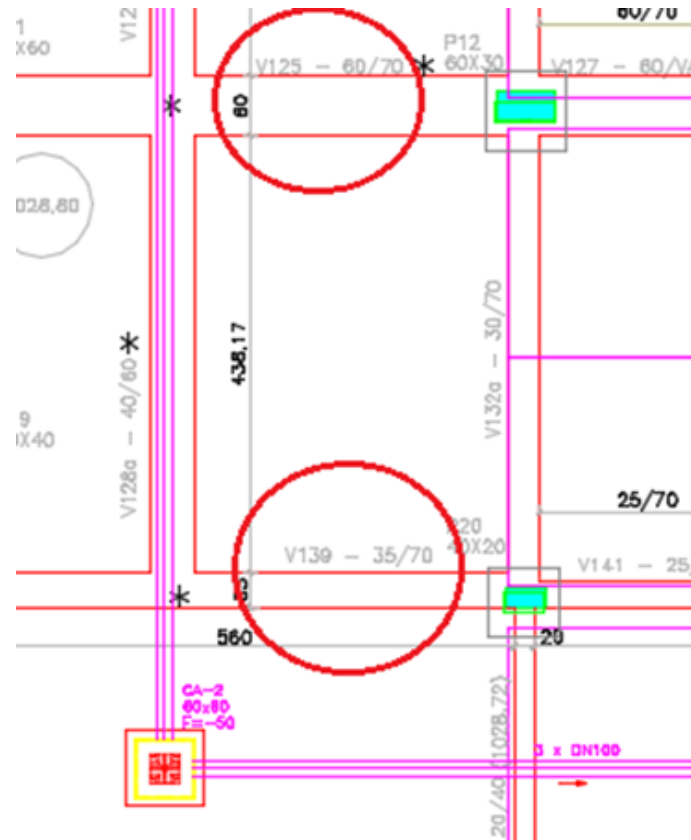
Beams analyzed for the passage of hydraulic piping. Source - Construtora Collection, 2016
